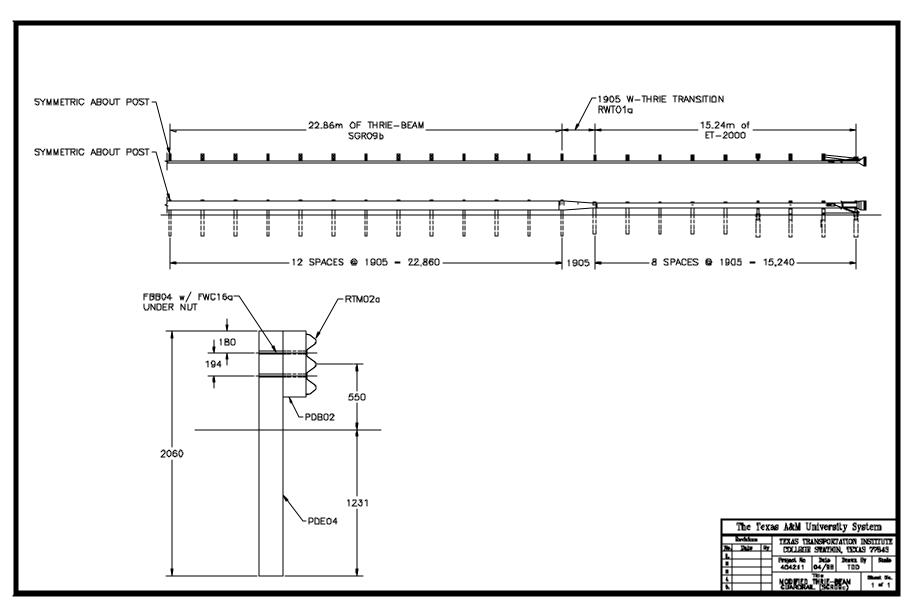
Details of the Strong Wood Post Thrie Beam guardrail installation.
